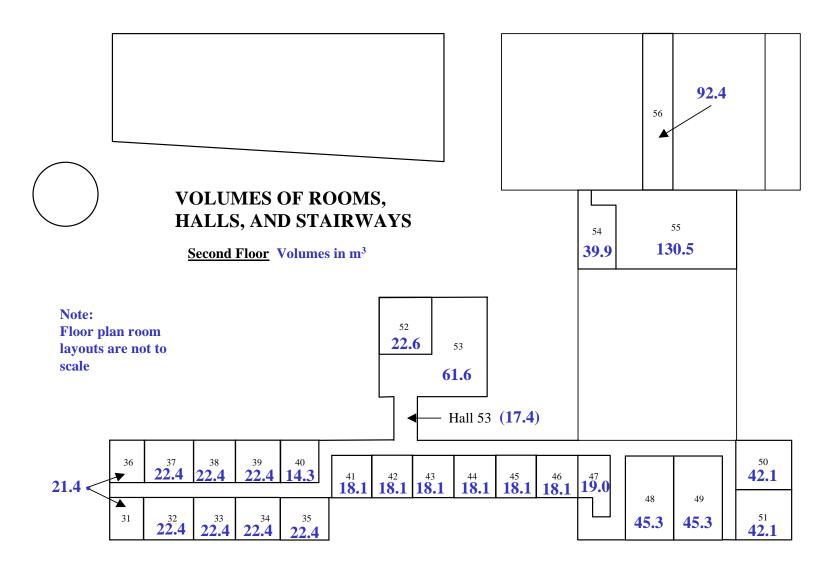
Volumes of Rooms, Halls, and Stairways on the Second Floor
